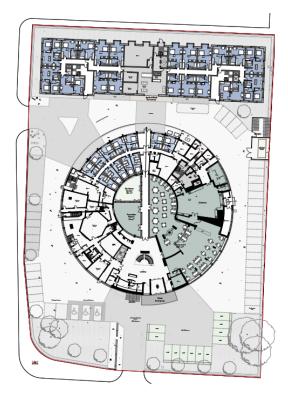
Proposed Site Plan (Taken from Drawing No. 1041-099 Rev P1 [Proposed Site Plan] (by Ackroyd Lowrie))
